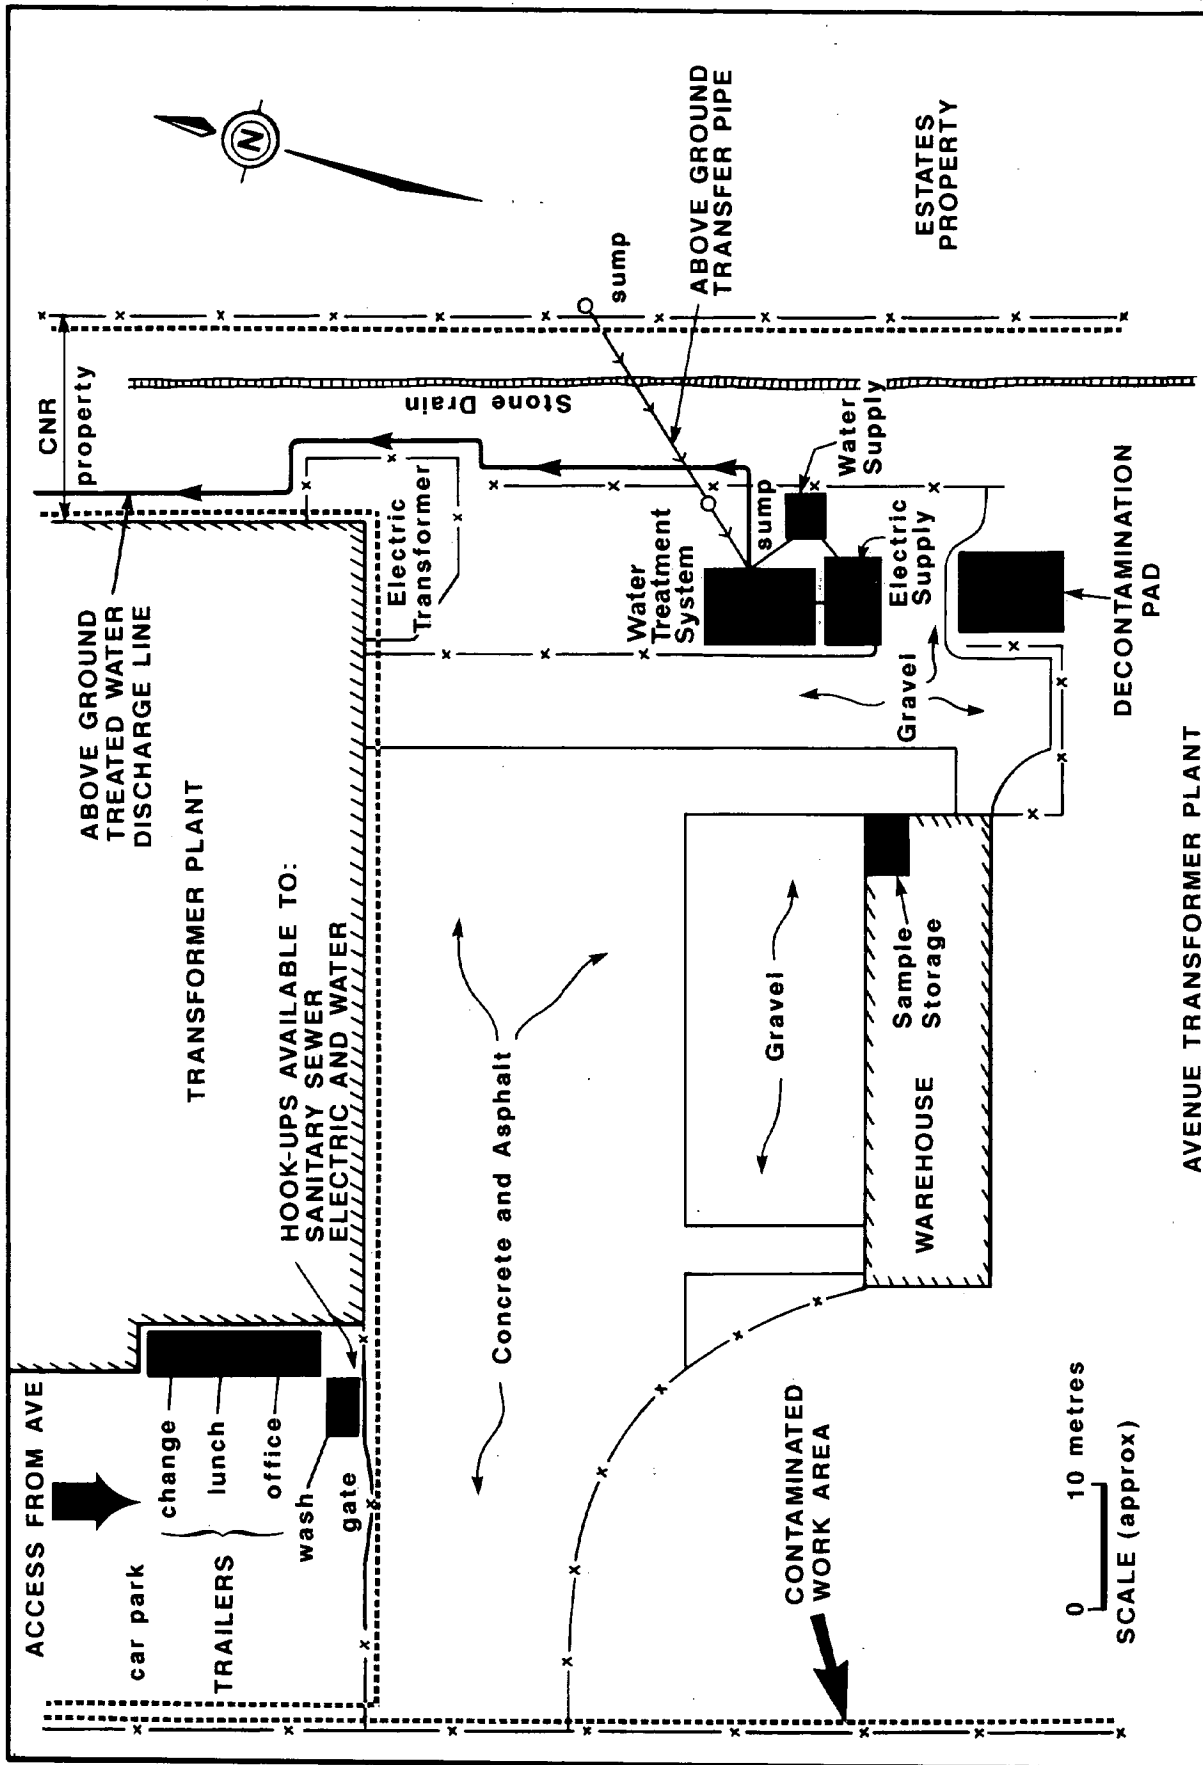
CLEAN-UP OF PERIPHERAL PCB CONTAMINATION
